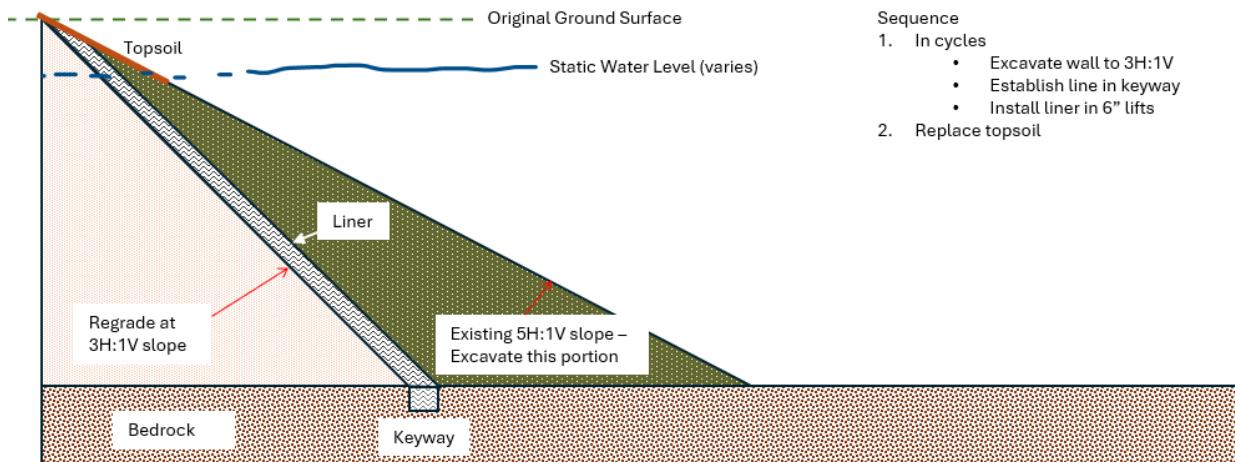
Typical Fully Reclaimed Liner and Backfill Construction
